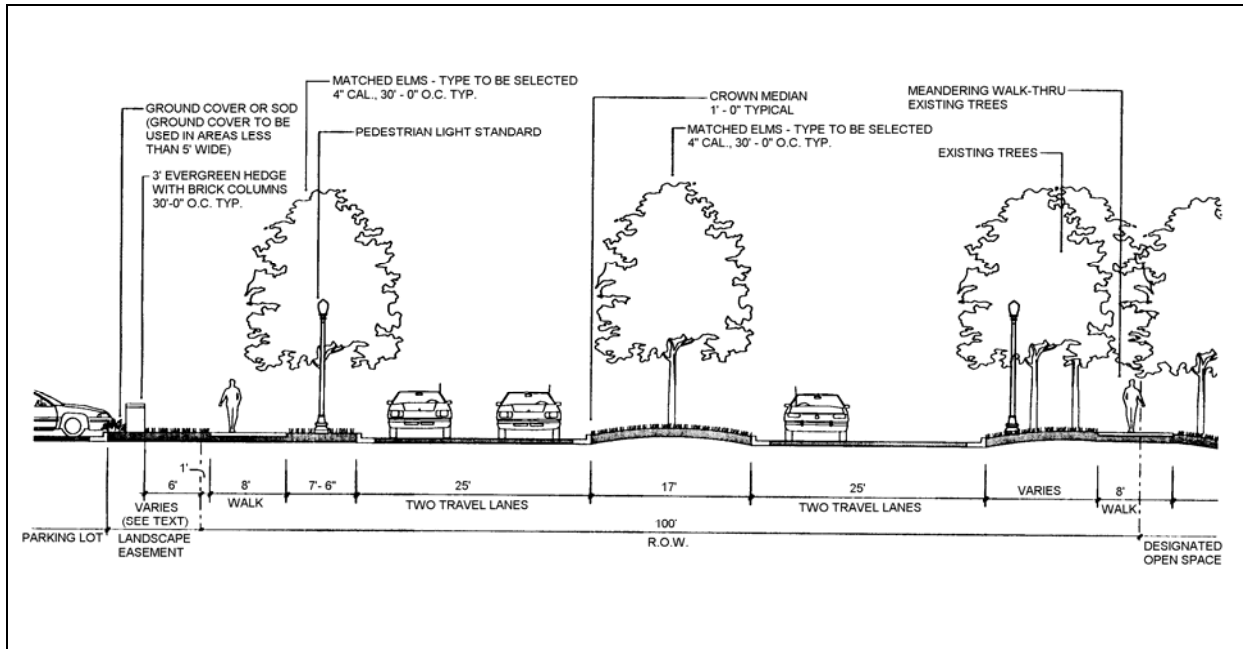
Bear Creek Parkway (Divided Cross Section)
